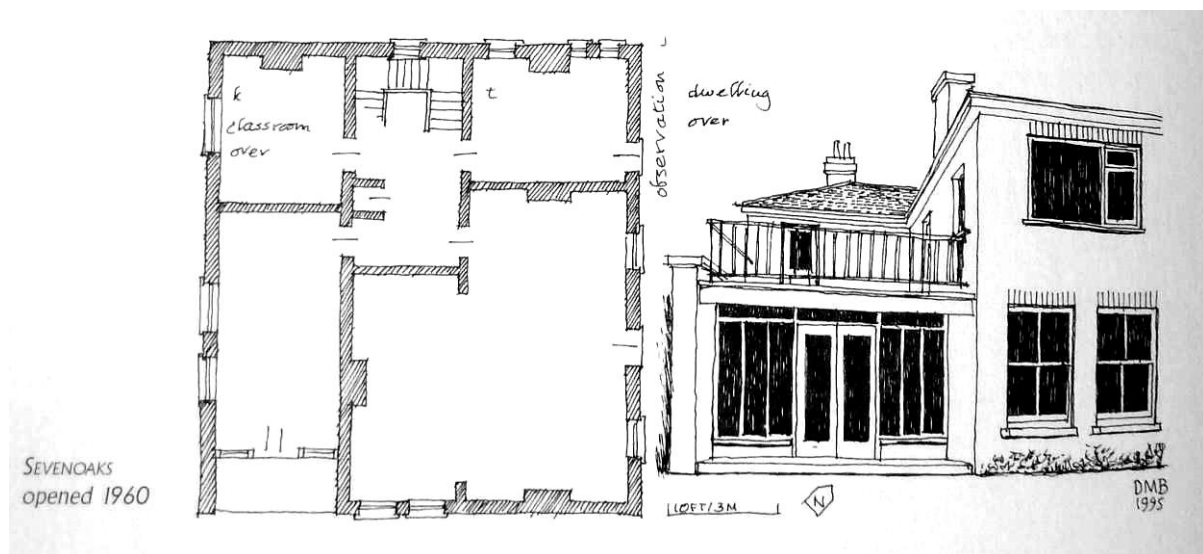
Plan and elevation, from Butler, vol. 1, p.268
